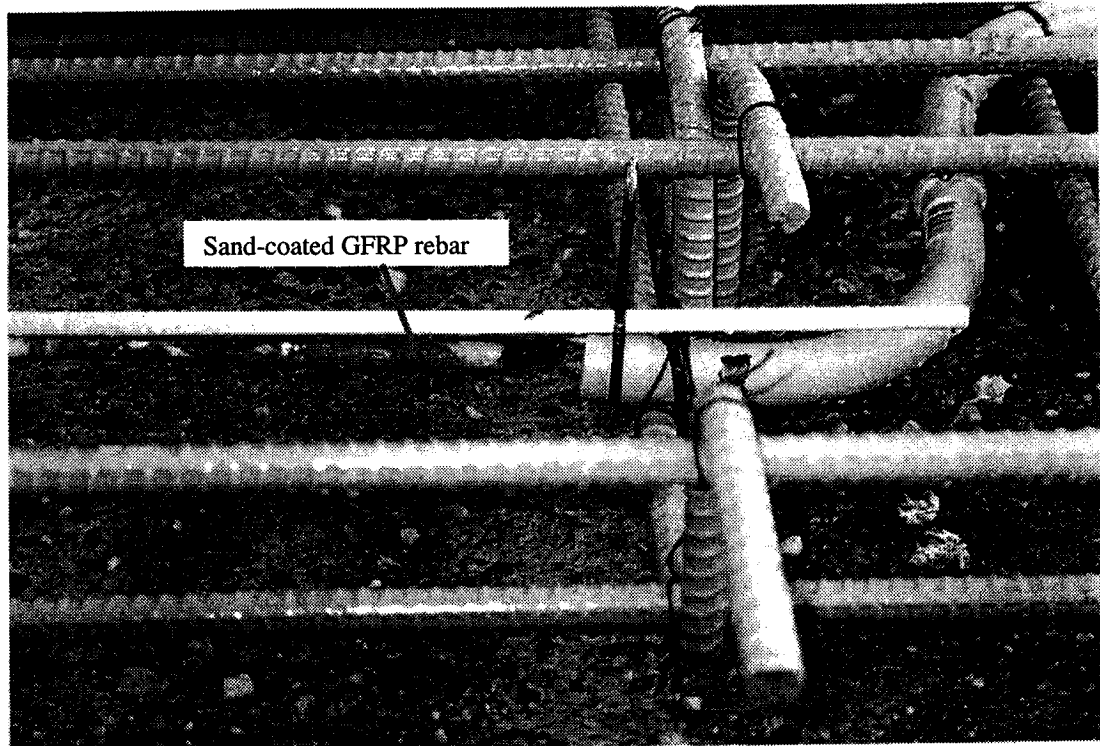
Close-up view of GFRP rebar in Waterloo Creek Bridge deck [Tsai and Ventura, 1998]
